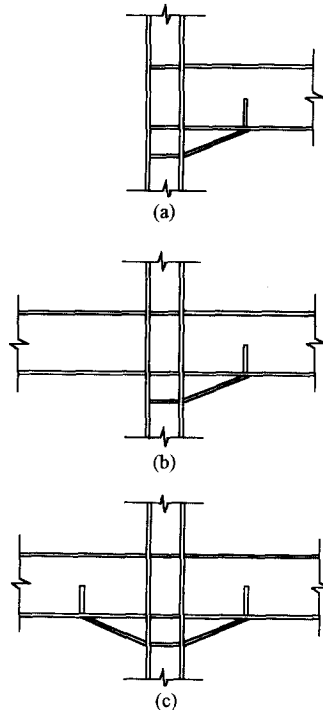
Haunch reinforcements on the bottom side of the beam: (a) exterior connection; (b) interior connection (haunch on one side); (c) interior connection (haunches on both sides).
